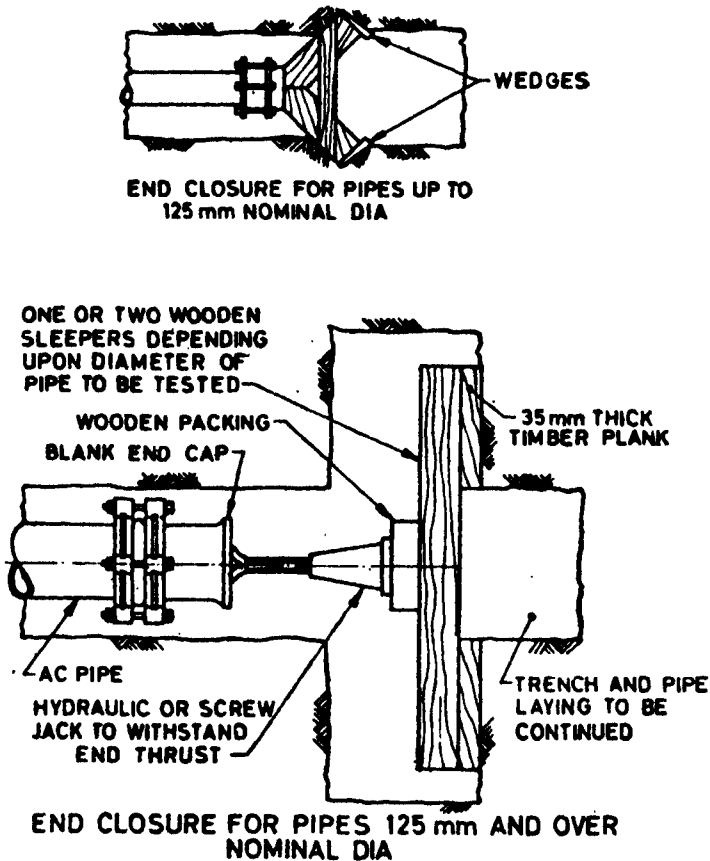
TYPICAL DETAIL OF SHORING AT THE PIPE END FOR TESTING
